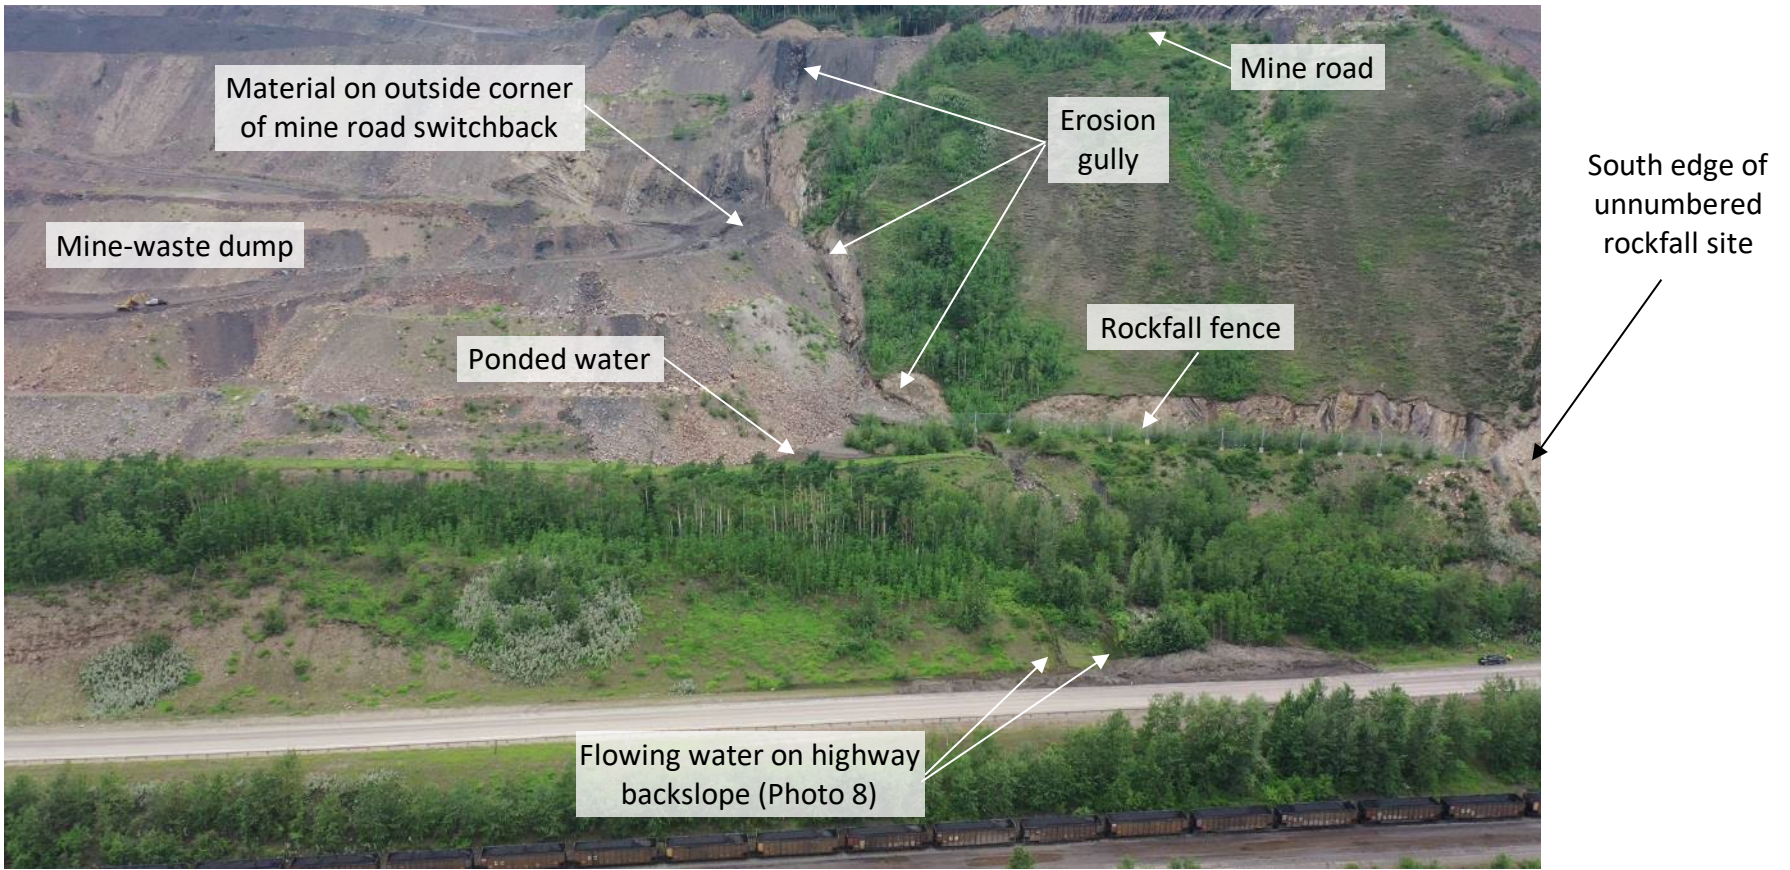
Overview of site. Photo taken with UAV on June 22, 2023, facing southwest.
